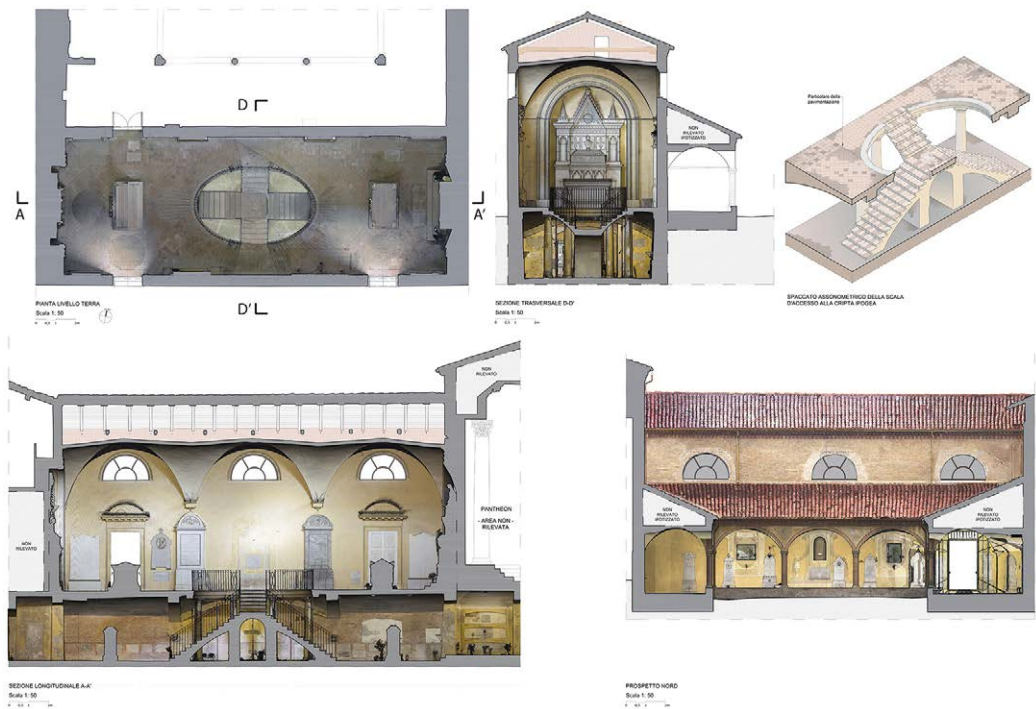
Plan representation, section, elevation of the Hall and axonometry of a portion of the staircase. Authors' elaborations.
